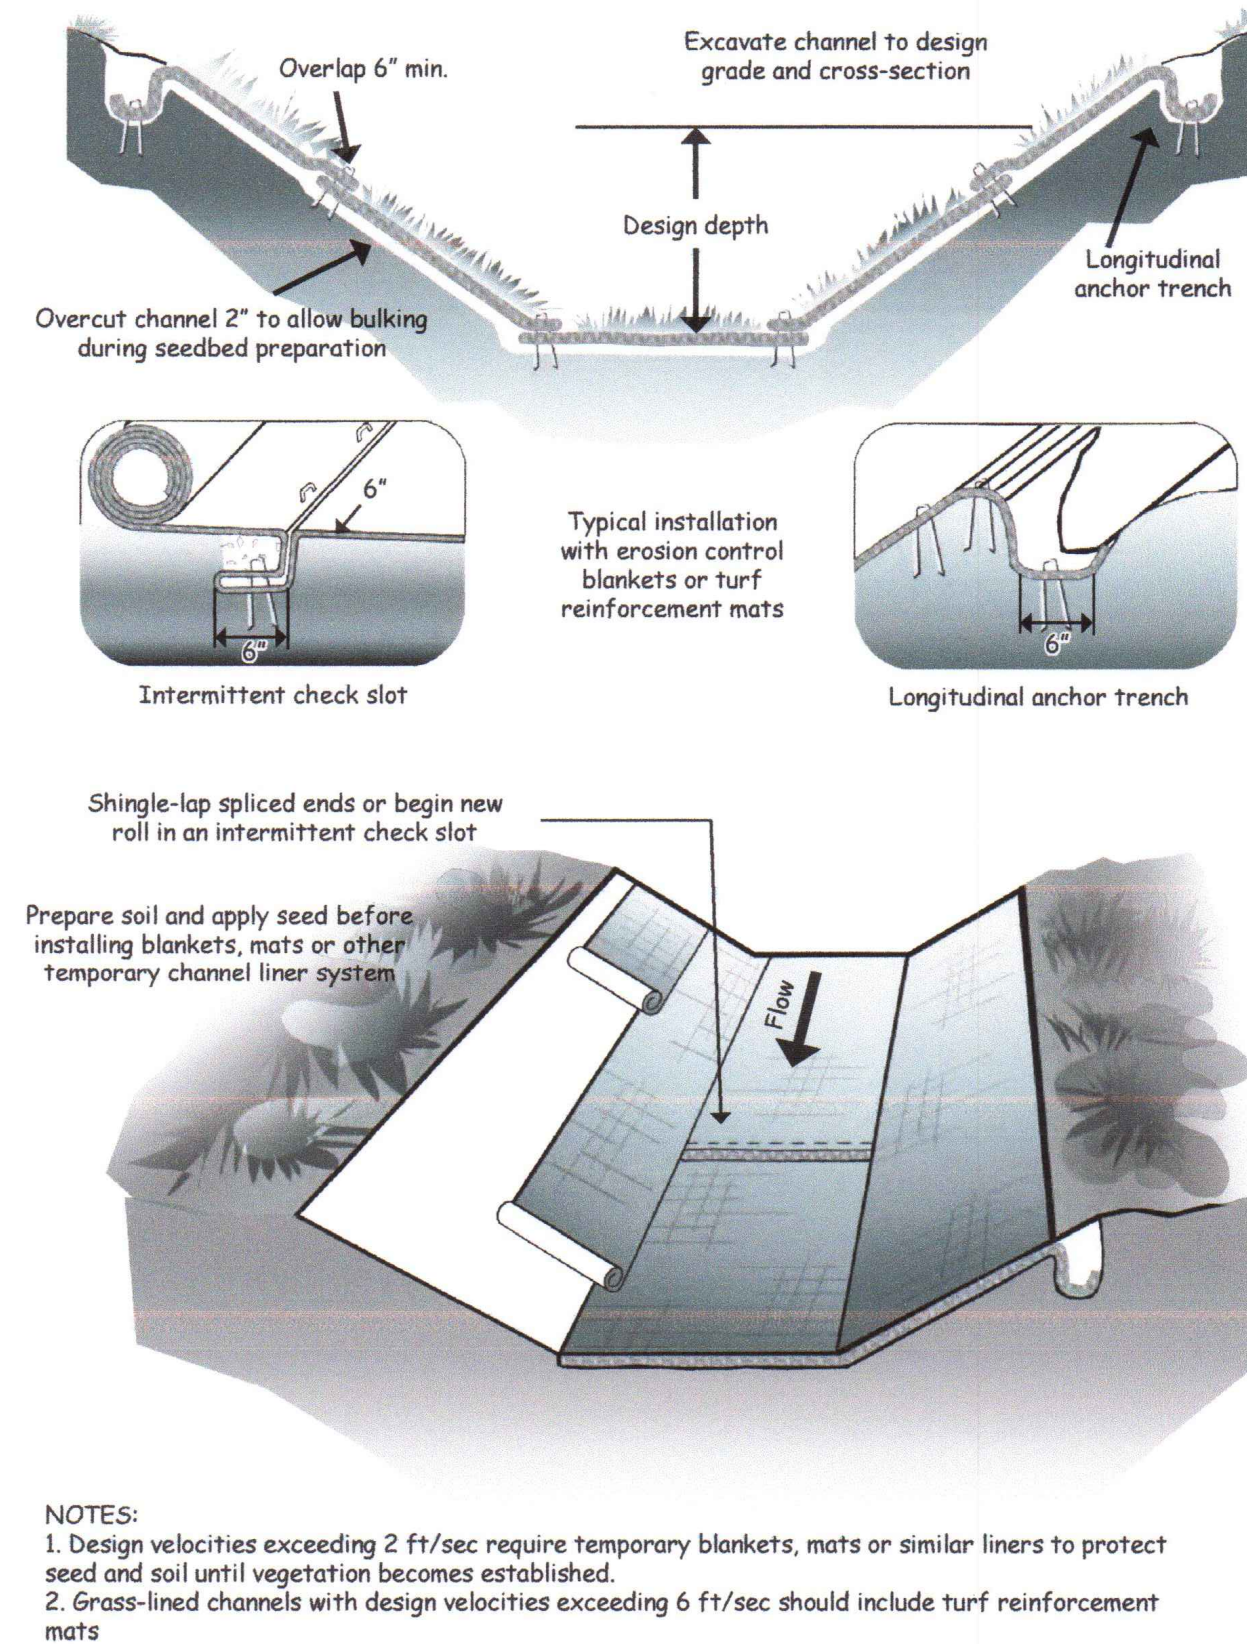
Channel Installation and Slope Installation; Washington State Ecology Department
